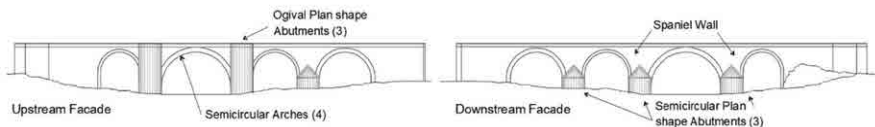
Left, Upstream Façade Las Donadas Bridge. Source (Author 2018) Right, Downstream Façade of Las Donadas Bridge. Source (Author 2020)
